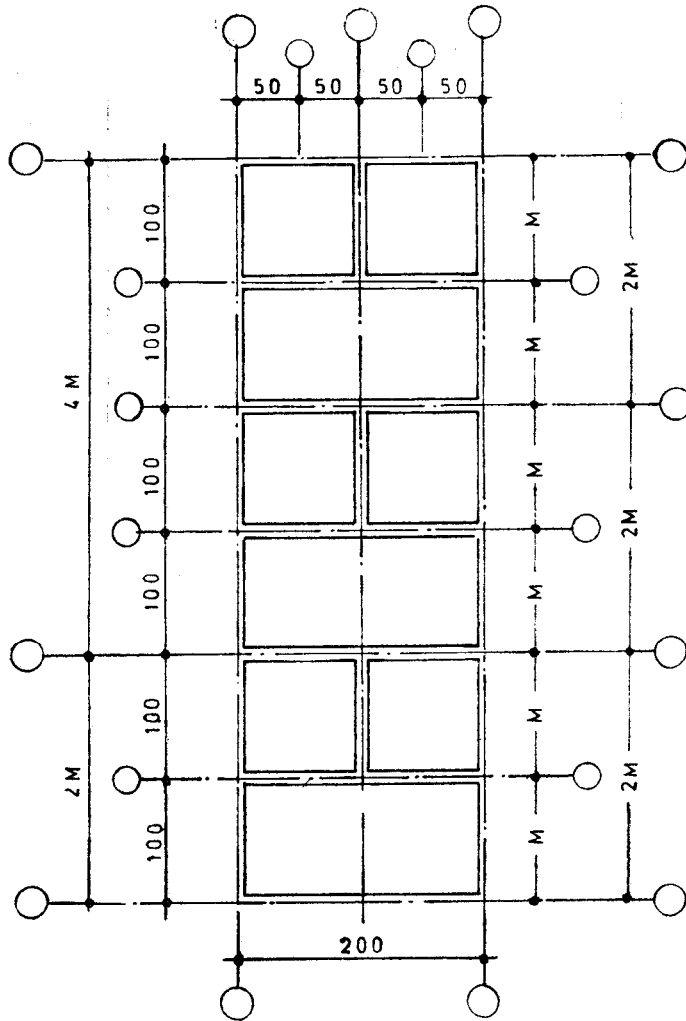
B BOND DIMENSIONS FOR NON-MODULAR BRICKS
